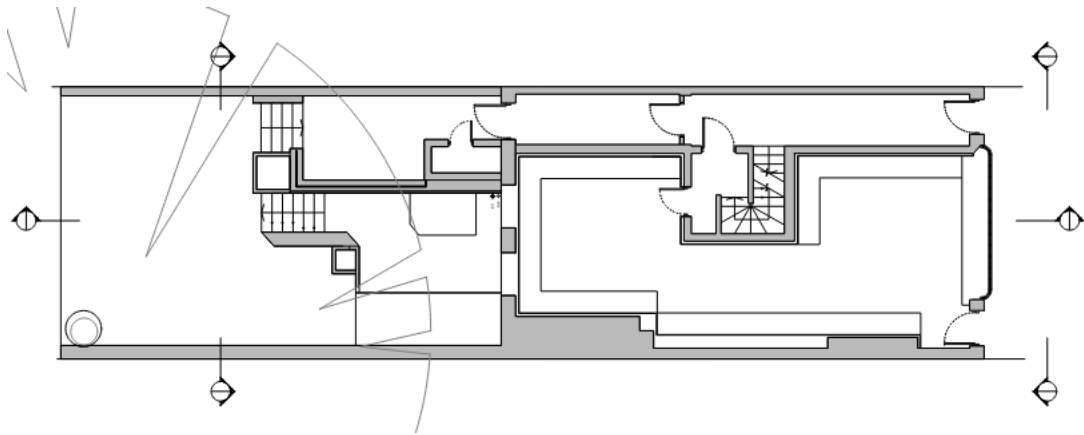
(above): Existing ground floor plan (source: existing drawings)
